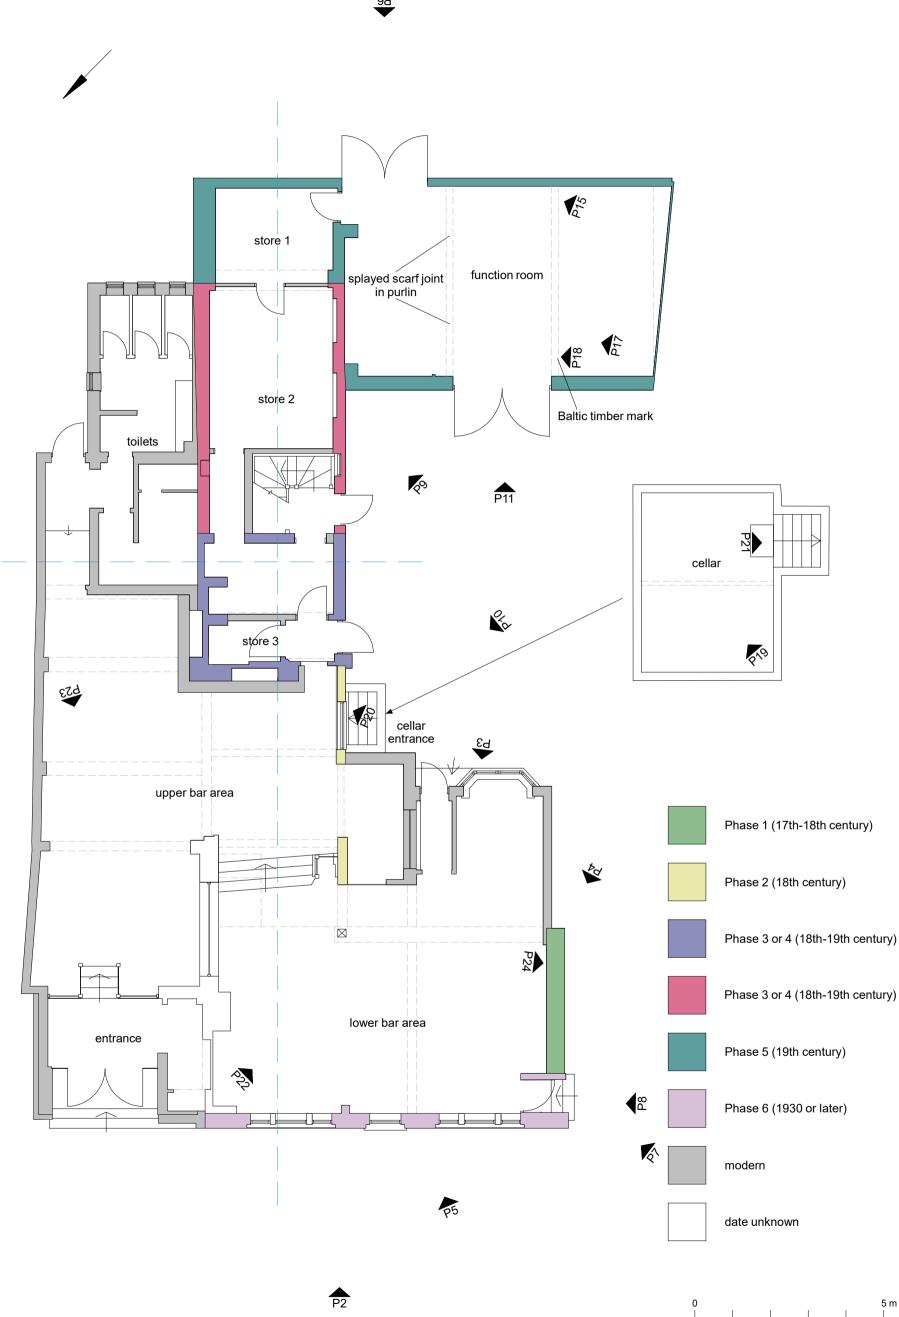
Ground floor plan with cellar plan. Location and direction of photographs reproduced in the text shown. Cross section locations show in blue (Fig 10)
